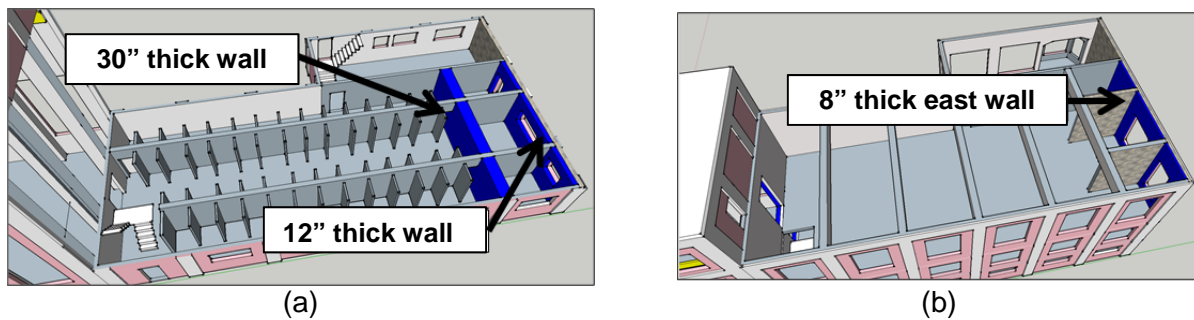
Retrofit of Reinforced Concrete Shear Walls for (a) First and (b) Second Floor
